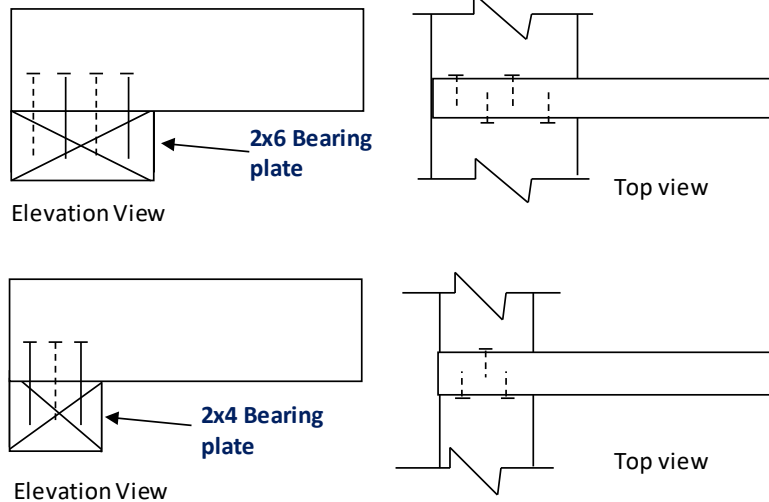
Toe-Nailing Rafter / Ceiling Member to Girder Truss
